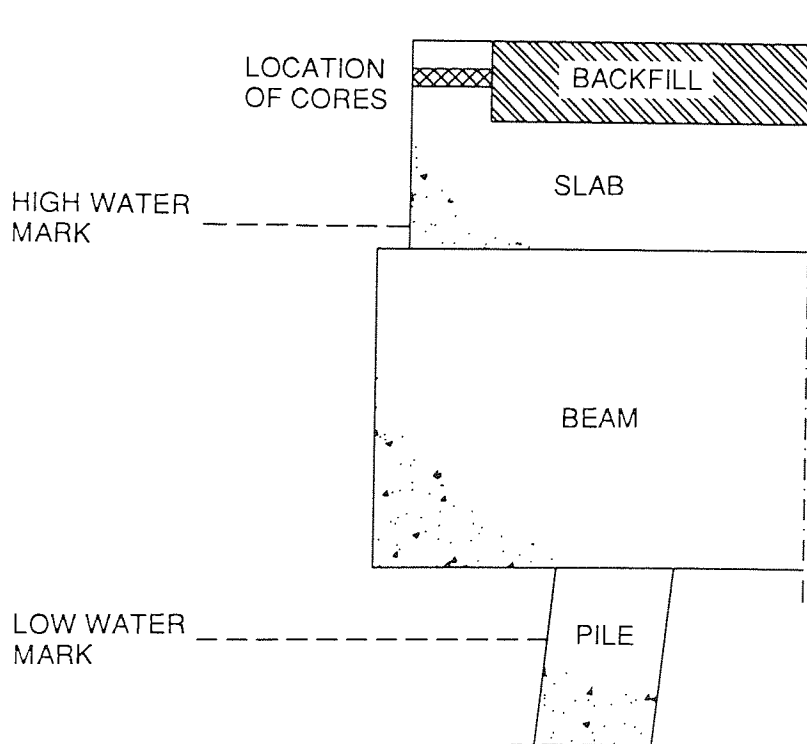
Cross Section of BFSC Quay Wall and Core Location
